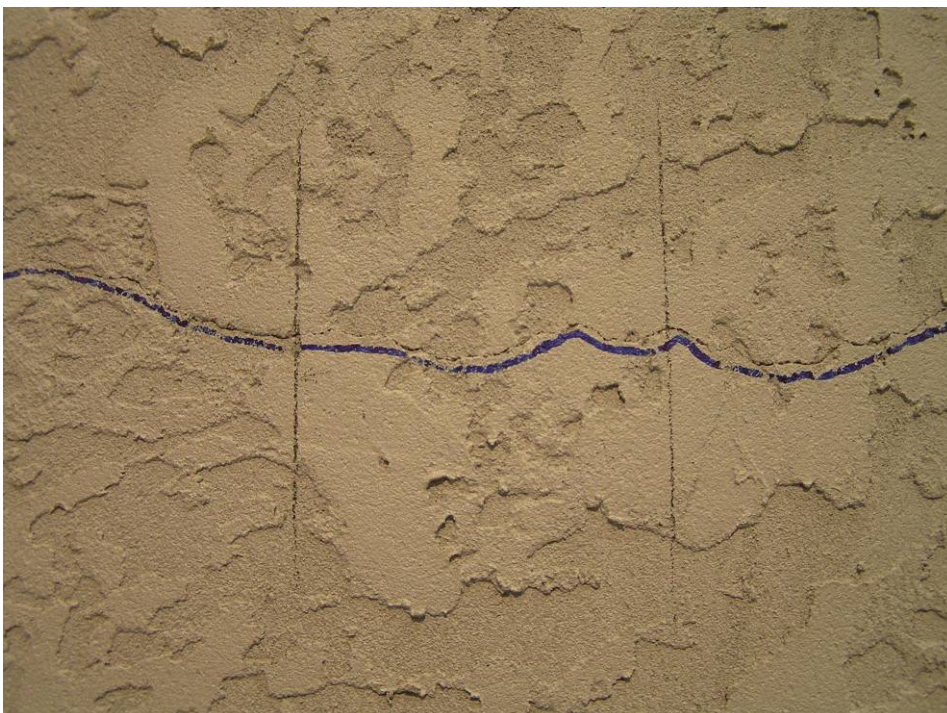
1 mm wide crack prepared and then ‘bagged’ over
